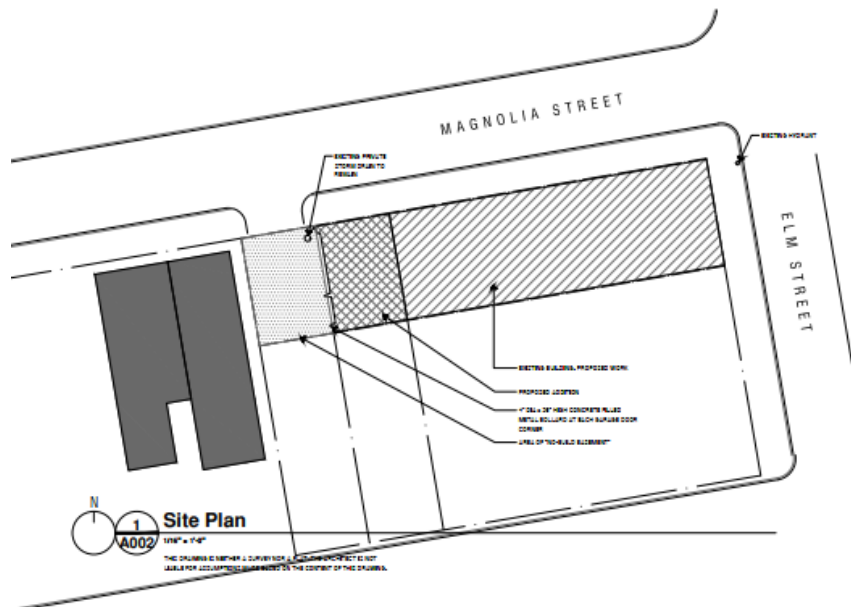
Site plan provided by the applicant showing the two areas to be consolidated with the existing 1419 Elm Street parcel.
